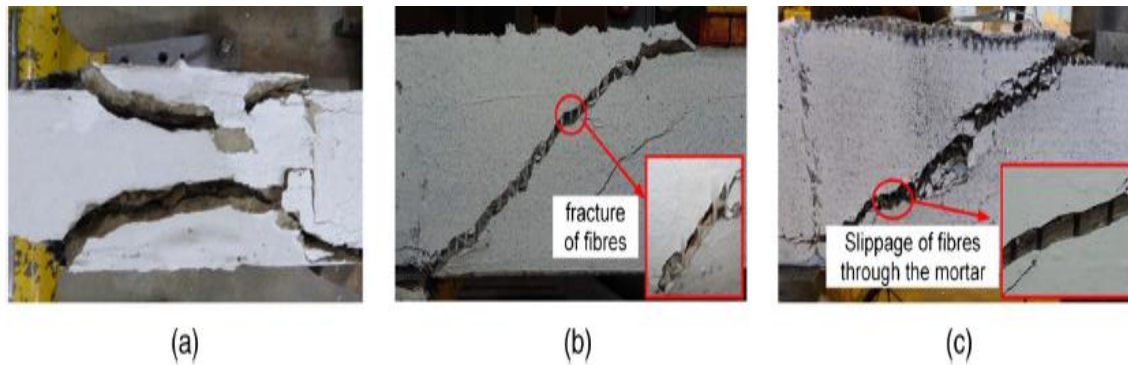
failure modes of RC beam strengthened in shear with TRM jacketing
